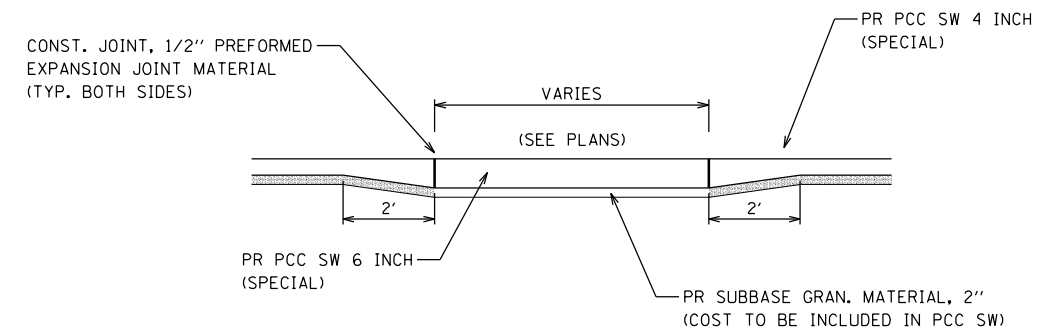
DETAIL CURB AND GUTTER INLET EXPANSION JOINT
